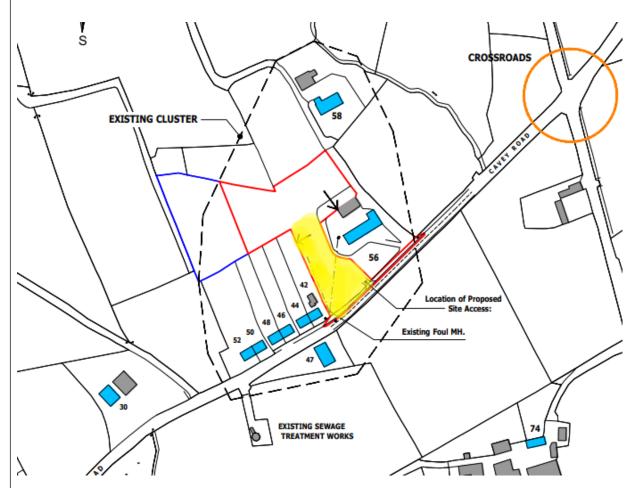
The site location plan above shows the area shaded yellow referred to in conditions 7 & 8.
